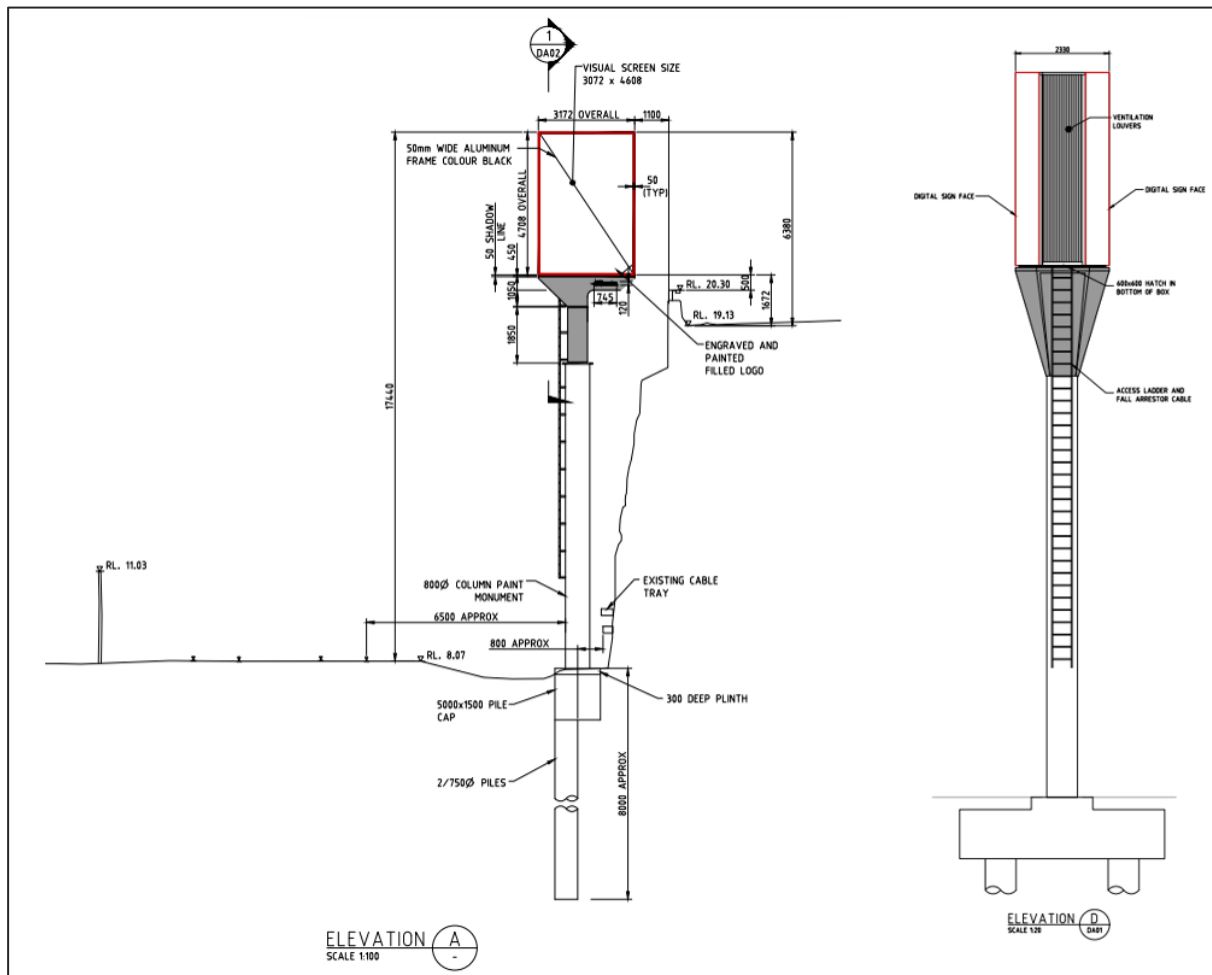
| Digital sign elevations (Source: revised Architectural Plans)
